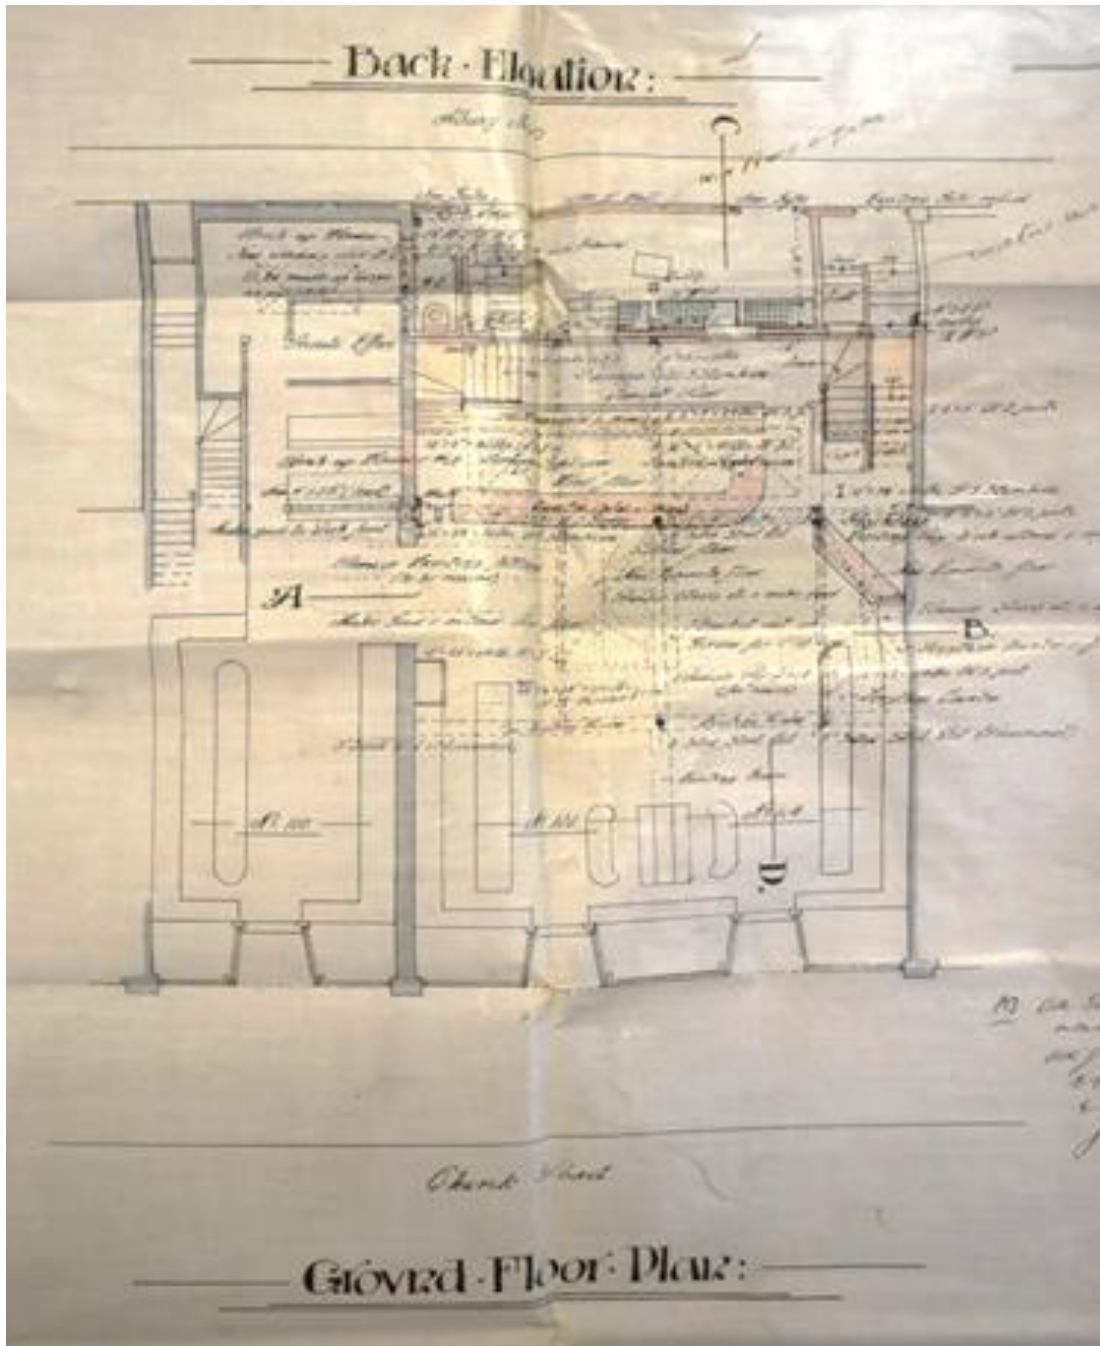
Building Control Drawings for proposed extension, dated 1911 (The Keep)
